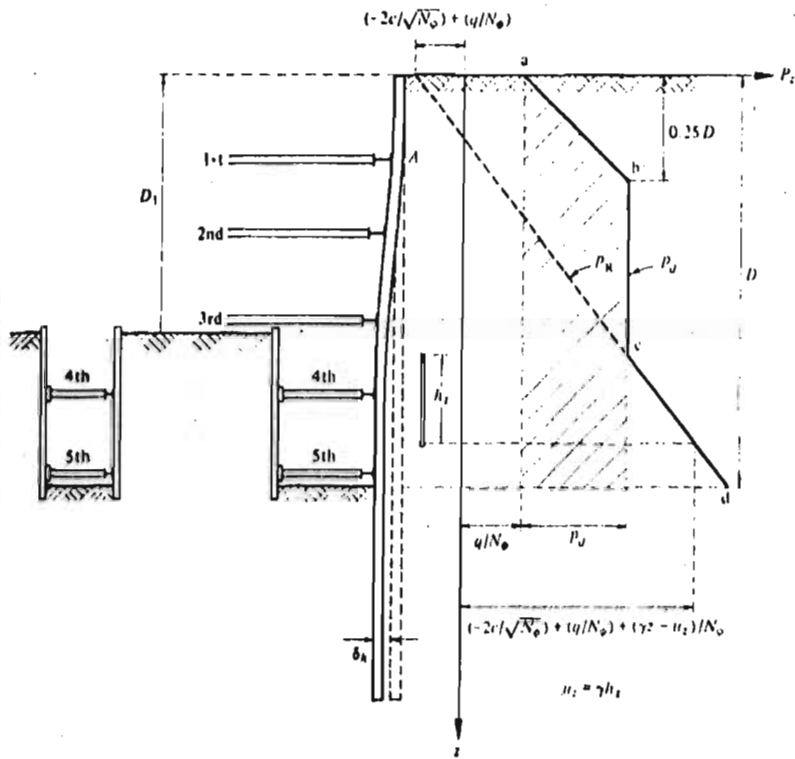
XI.3 Earth pressures on sheet-pile wall.
